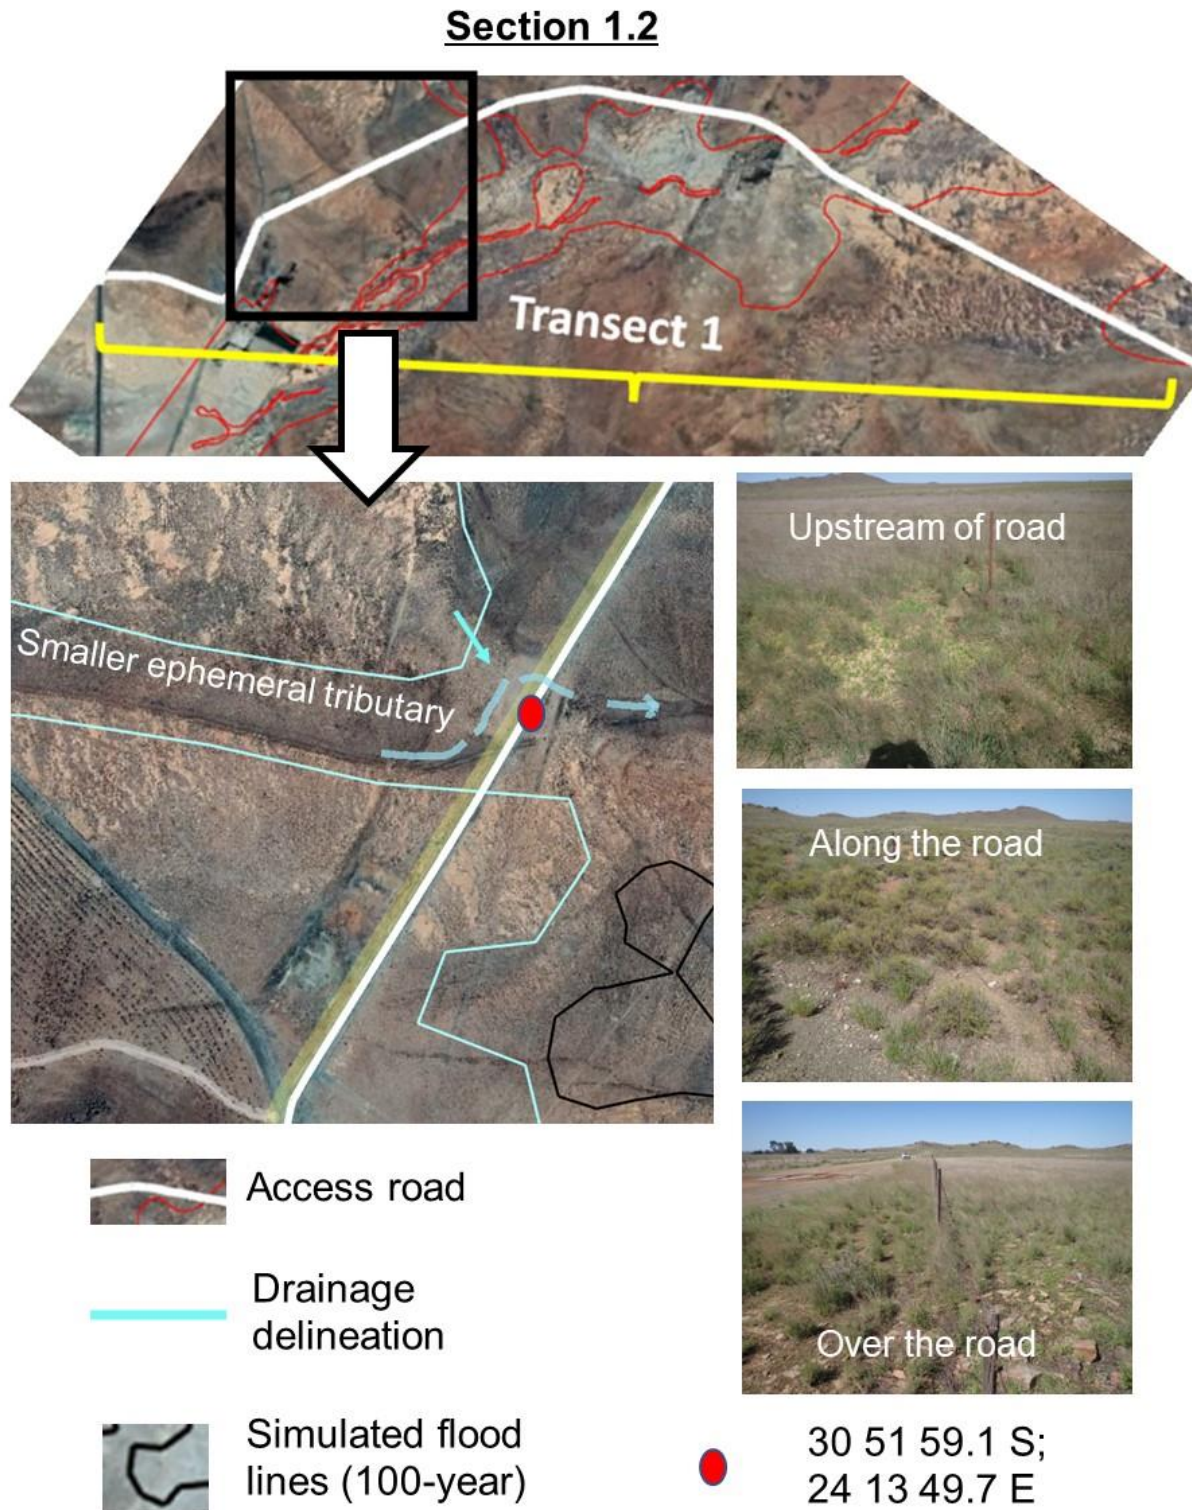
Road Section 1.2 of Transect 1, indicating the section of the road where a smaller ephemeral drainage line crosses the road.
